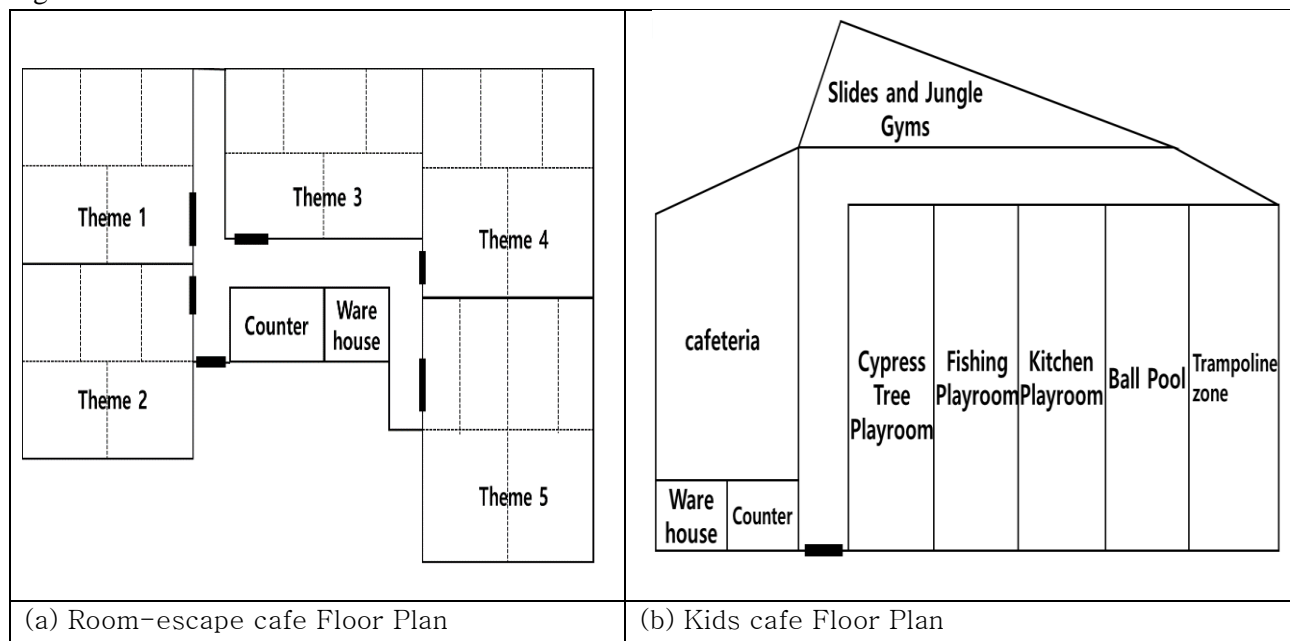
Room-escape cafe, Kids cafe Floor Plan
